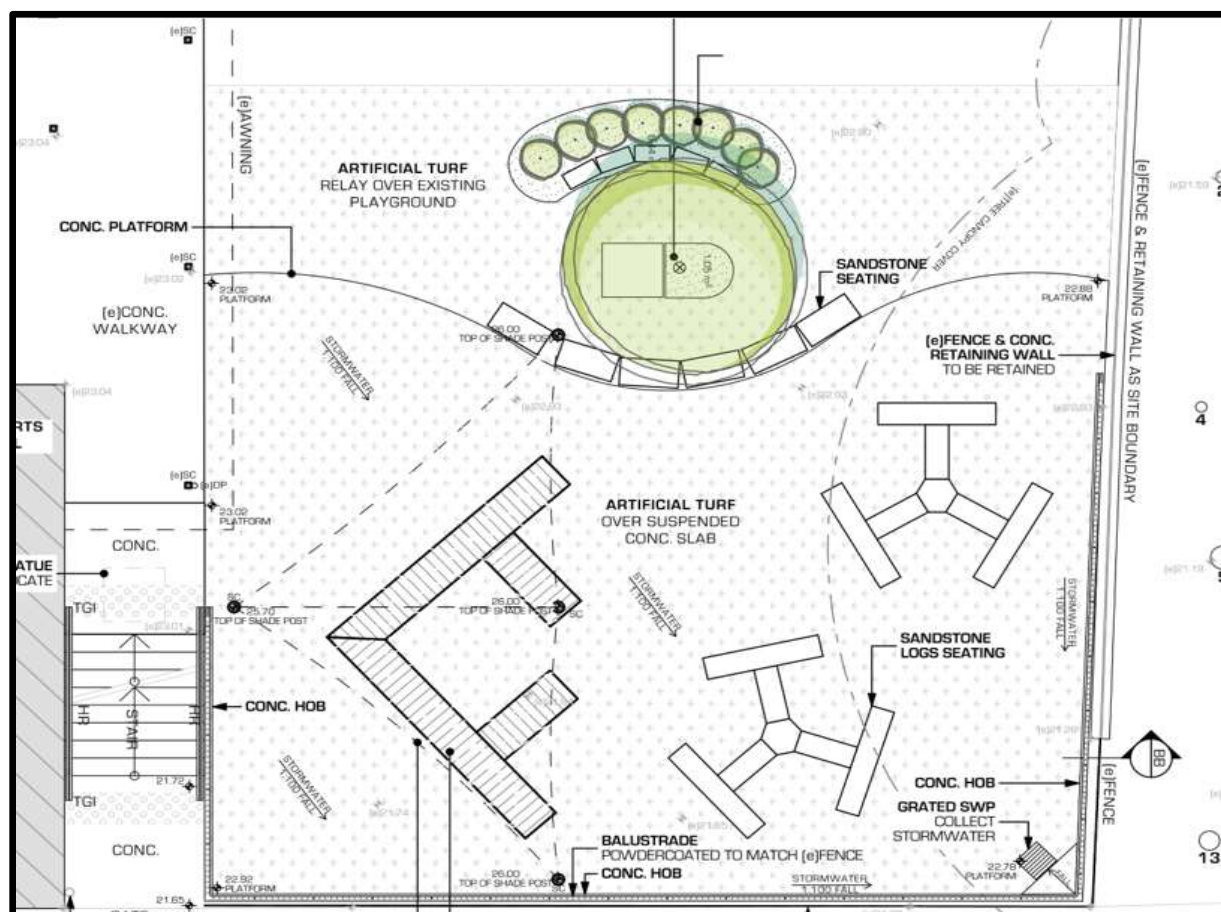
Landscape plan that shows the proposed design and improvements (courtesy: OHD Landscape Architects, 2020)
